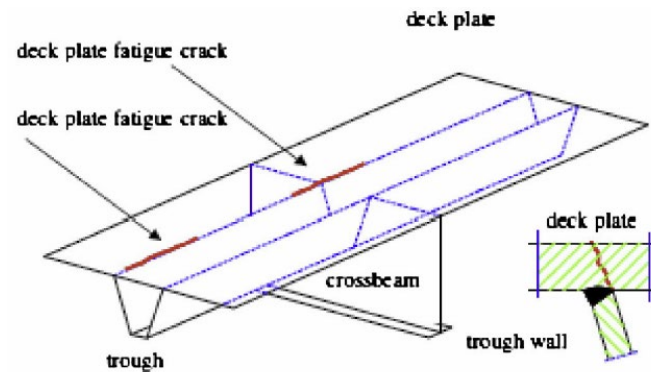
Details of an orthotropic bridge deck fatigue cracks [1].
